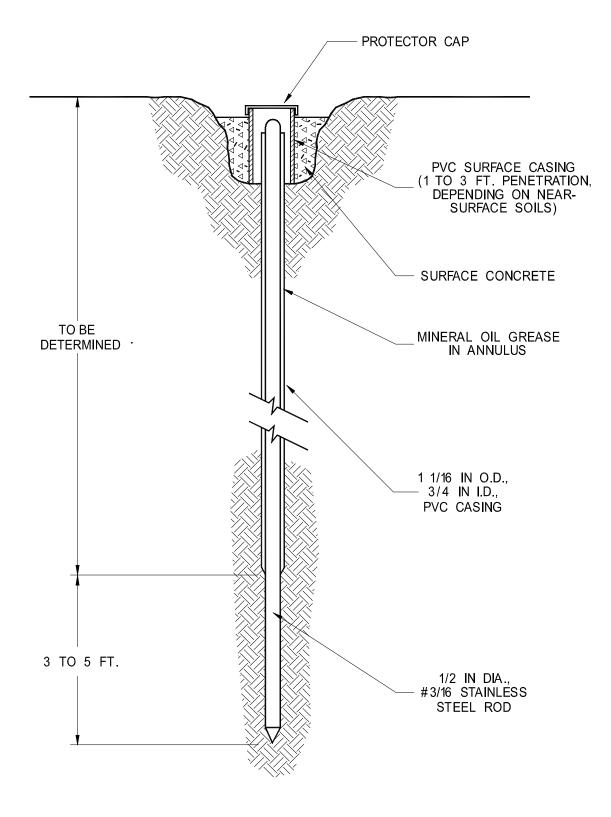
Geoprobe[®] Monitoring Well Surface Elevation Benchmark.
